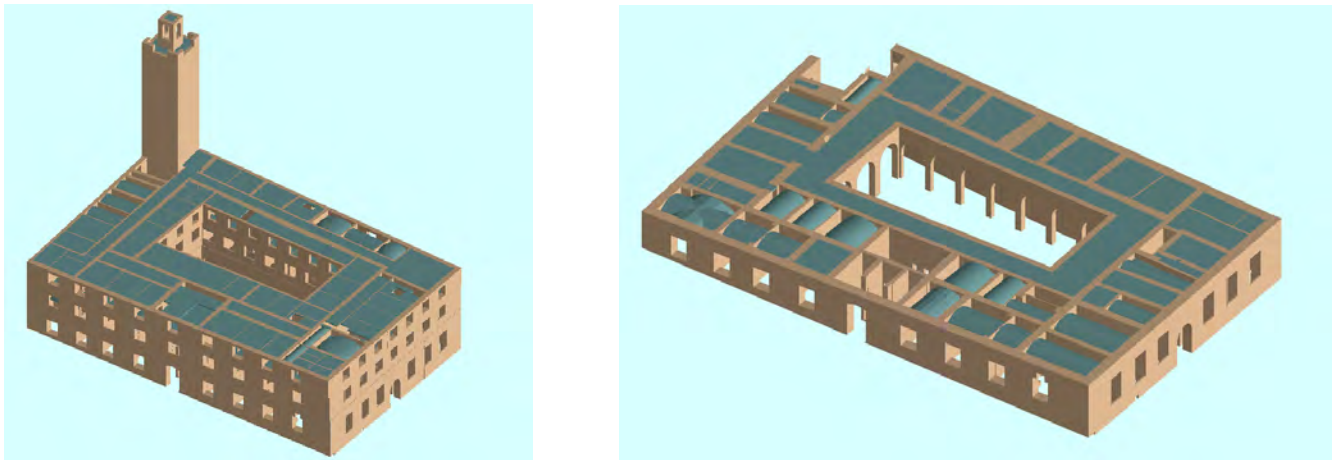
3D model of the palace (on the left) and model of the ground floor (on the right).
